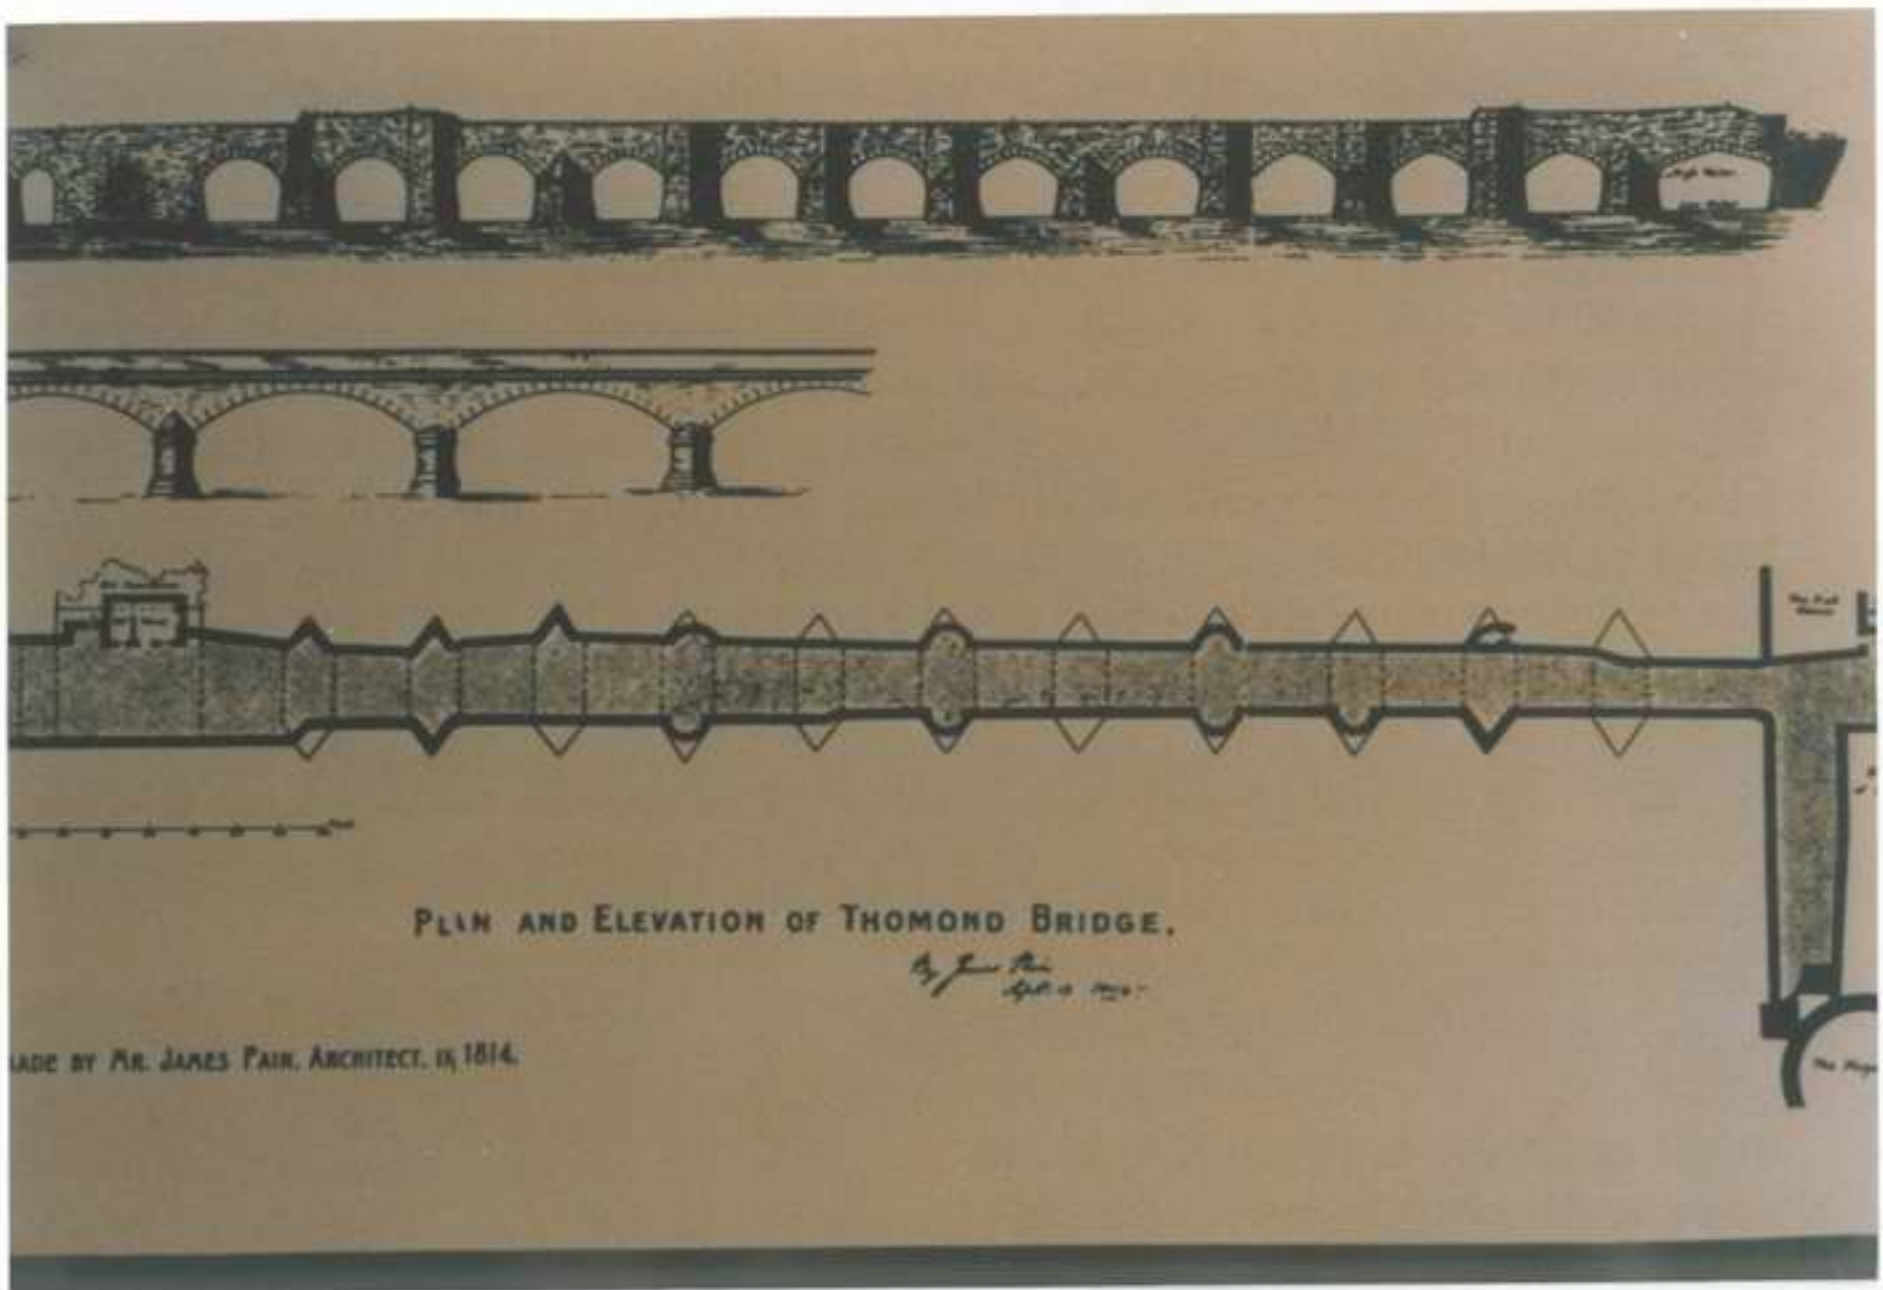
James Pain's 1814 Plan and Elevation for proposed new Thomond Bridge.
